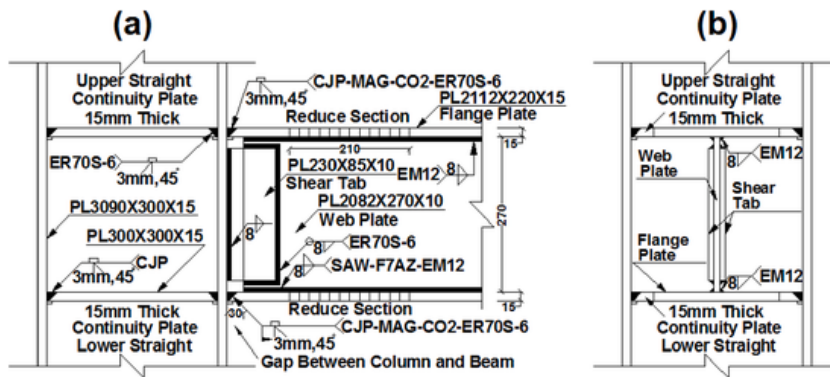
The fabrication detail of DFC, a) side view, b) front view (Dimensions are in millimeters).
